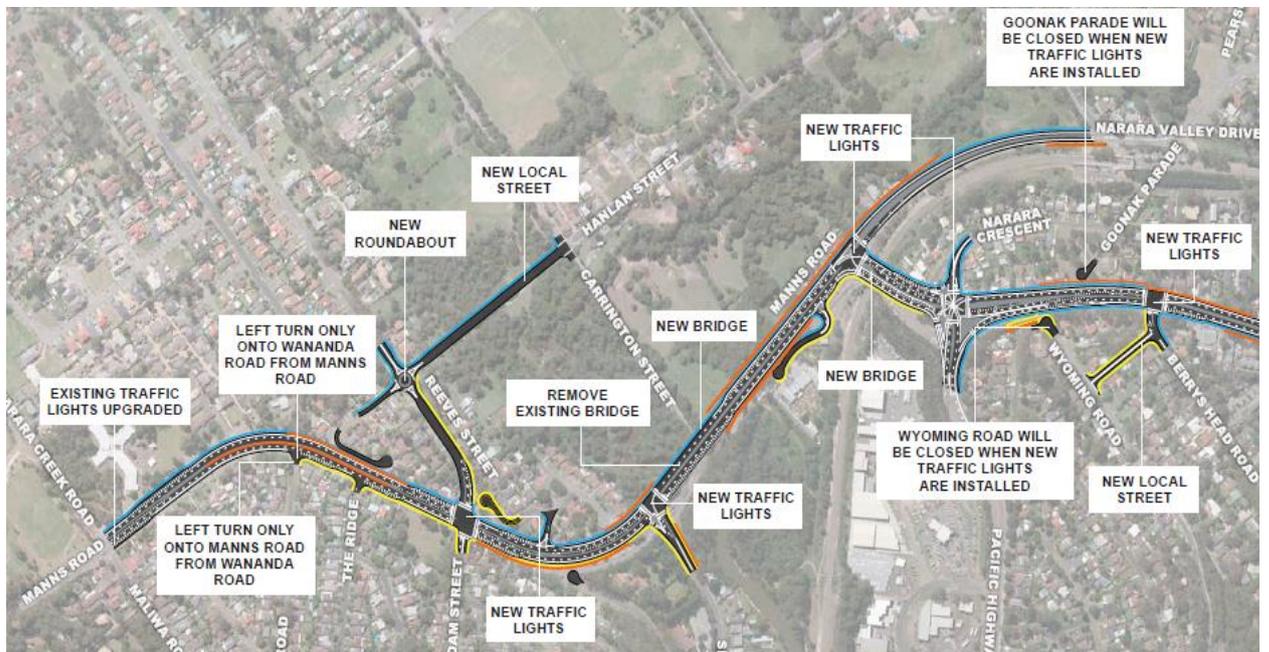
TD4 option layout between Reeves Street and Berrys Head Road
